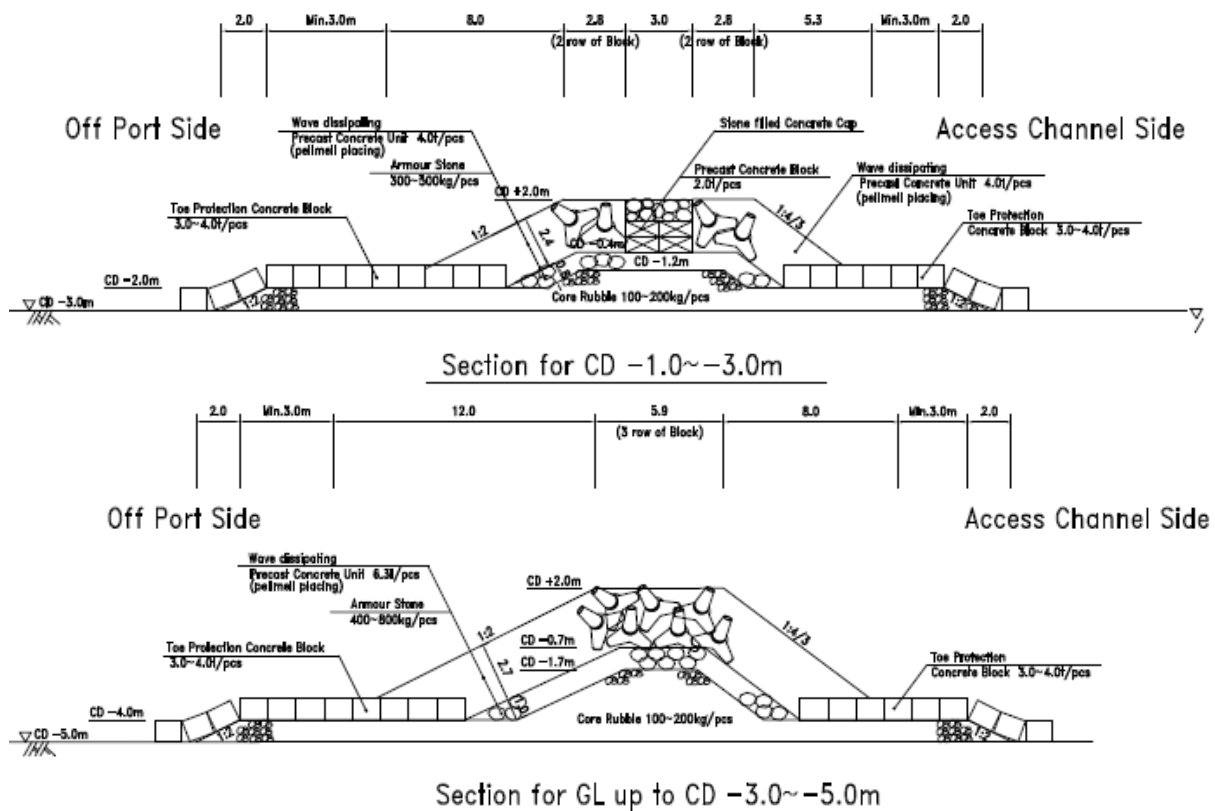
Typical Cross Section of Sand Protection Dyke
